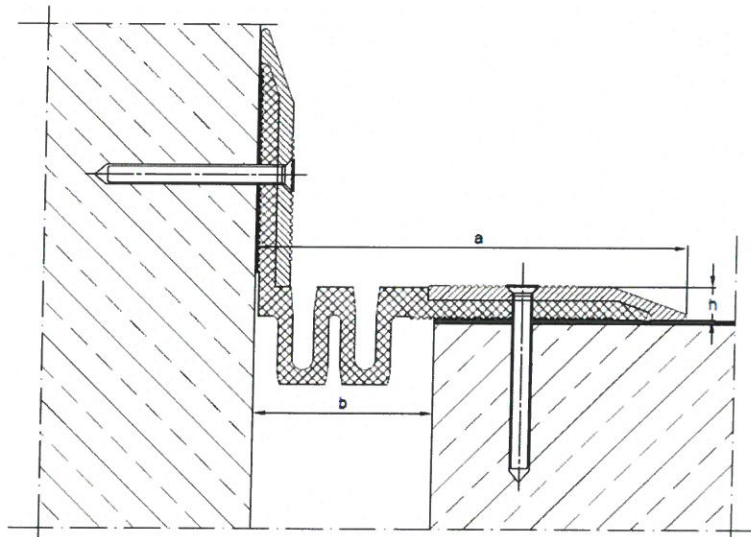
CONECTO PARK SL 210.50.CV waterproof expansion joint profile – wall mounted surface installation
